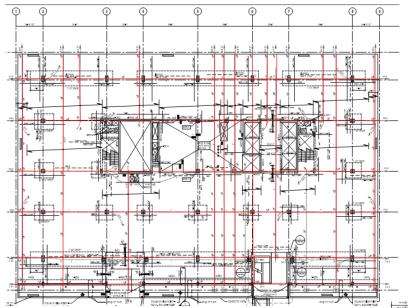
A typical floor plan with emphasis on the post tensioned cables.
